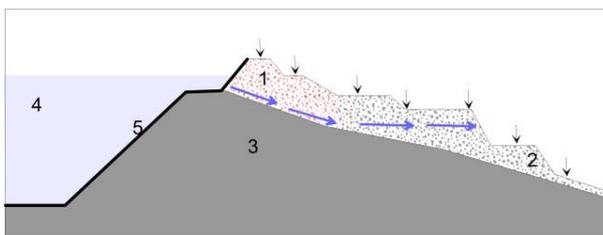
Dam scheme: 1 – thawed rockfill material; 2 – frozen rockfill material; 3 – frozen foundation; 4 – tailing; 5 – damp-proof membrane; black arrows – ERI profiles.
